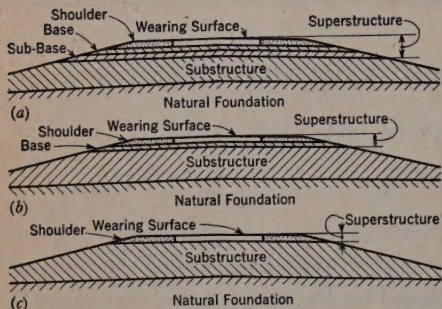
VERTICAL SUBDIVISION OF THE ROADWAY
